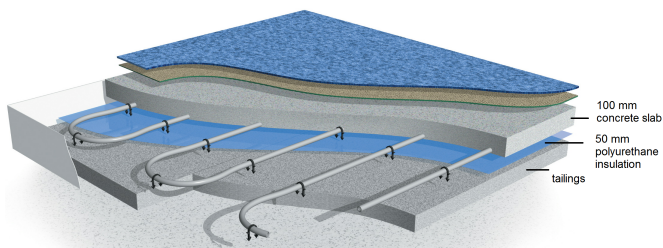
Serpentine hydronic floor heating pipes casted in a concrete slab sub-floor [Bui12].
